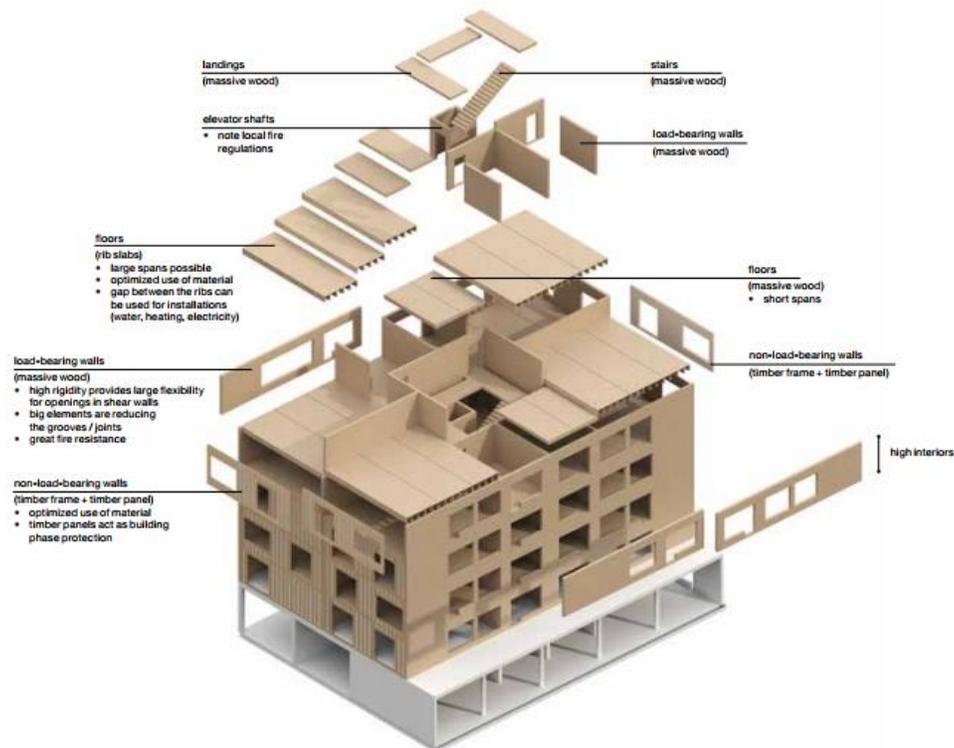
Application of CLT panels for different component of a multistory building (StoraEnso 2016).
